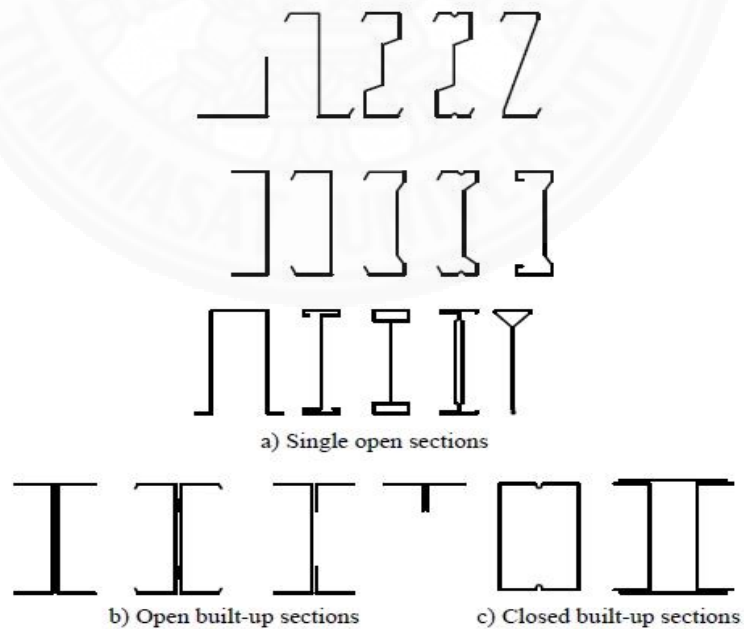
Type of cold-formed steel sections (Design of Cold-formed steel structures by Dan Dubina)
